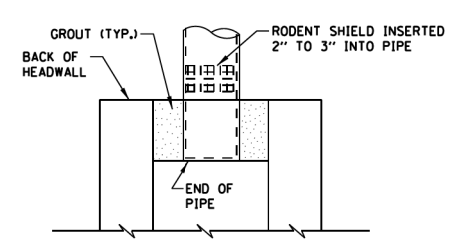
DETAIL OF PIPE UNDERDRAIN, 6"
